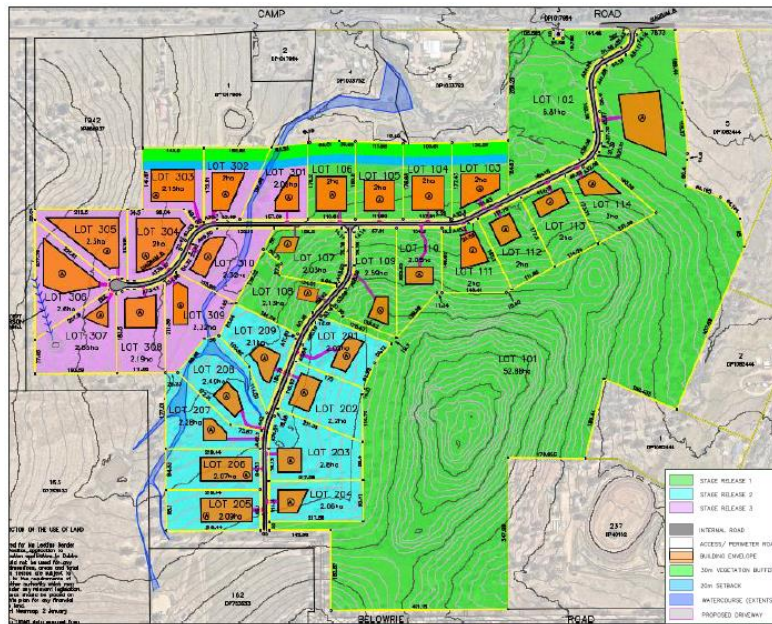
Approved amendment plan (Source: SLR SEE D2022-122 (Part 2))
